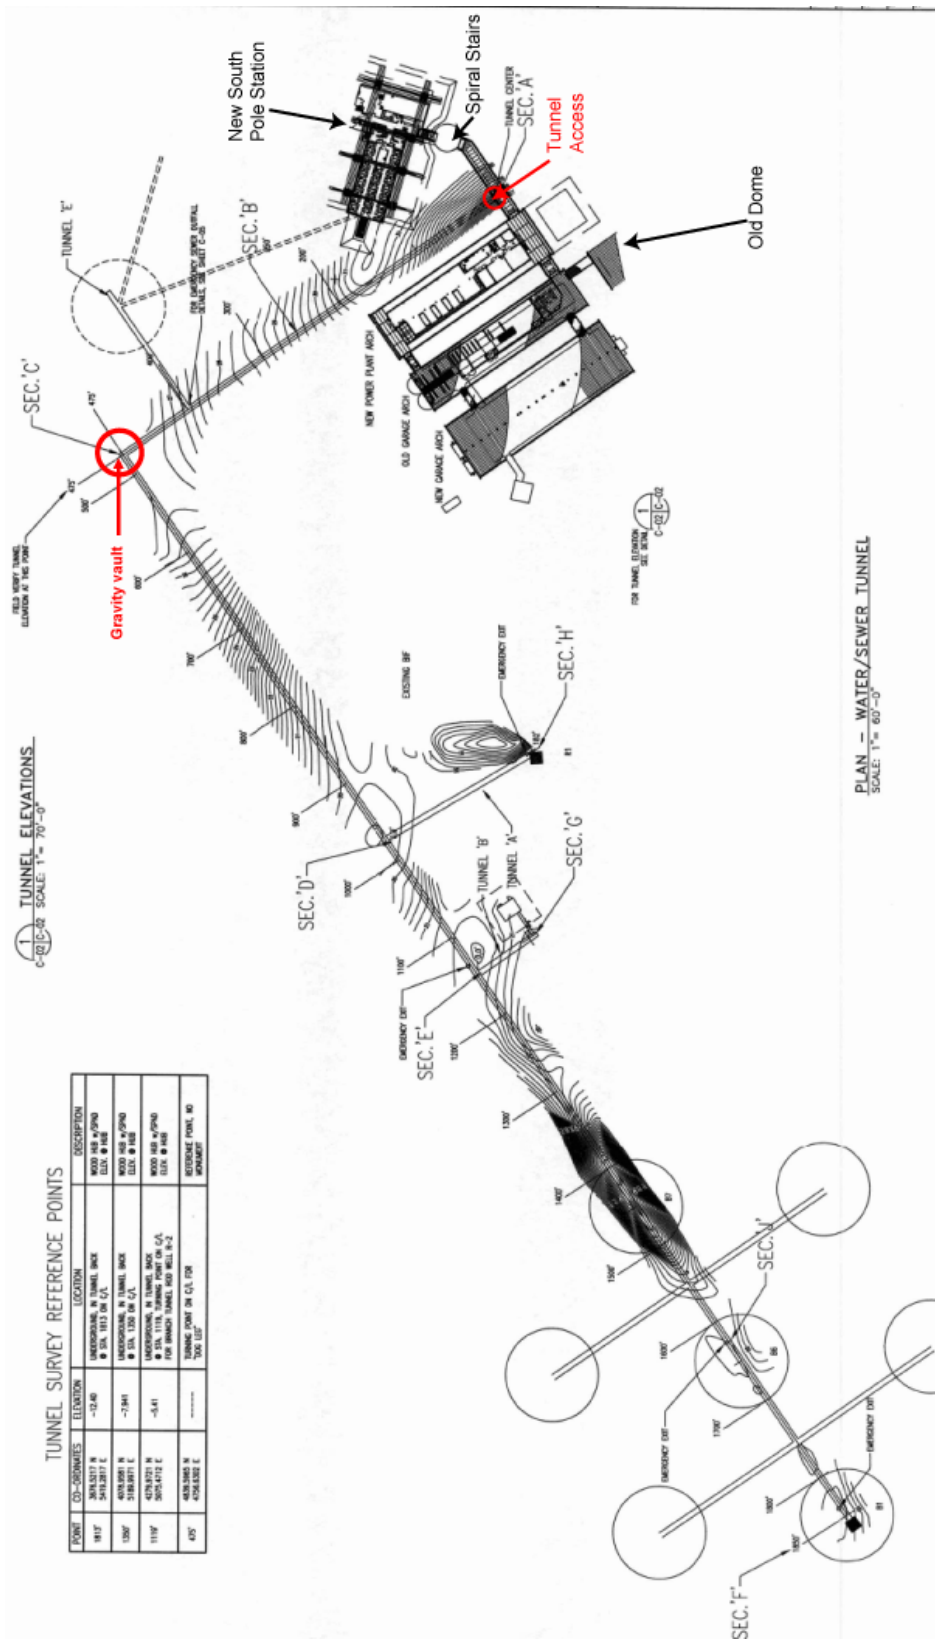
Raytheon Polar Services Sewer/Water Tunnel Profiles and Elevations at South Pole, sheet 3 of 25, drawn by C. Rock on 07/13/98. Labels added for the current location of the new gravity vault, old dome, new station, and spiral stairs (modified, image courtesy of P. Sullivan, pers. comm., 2008).
